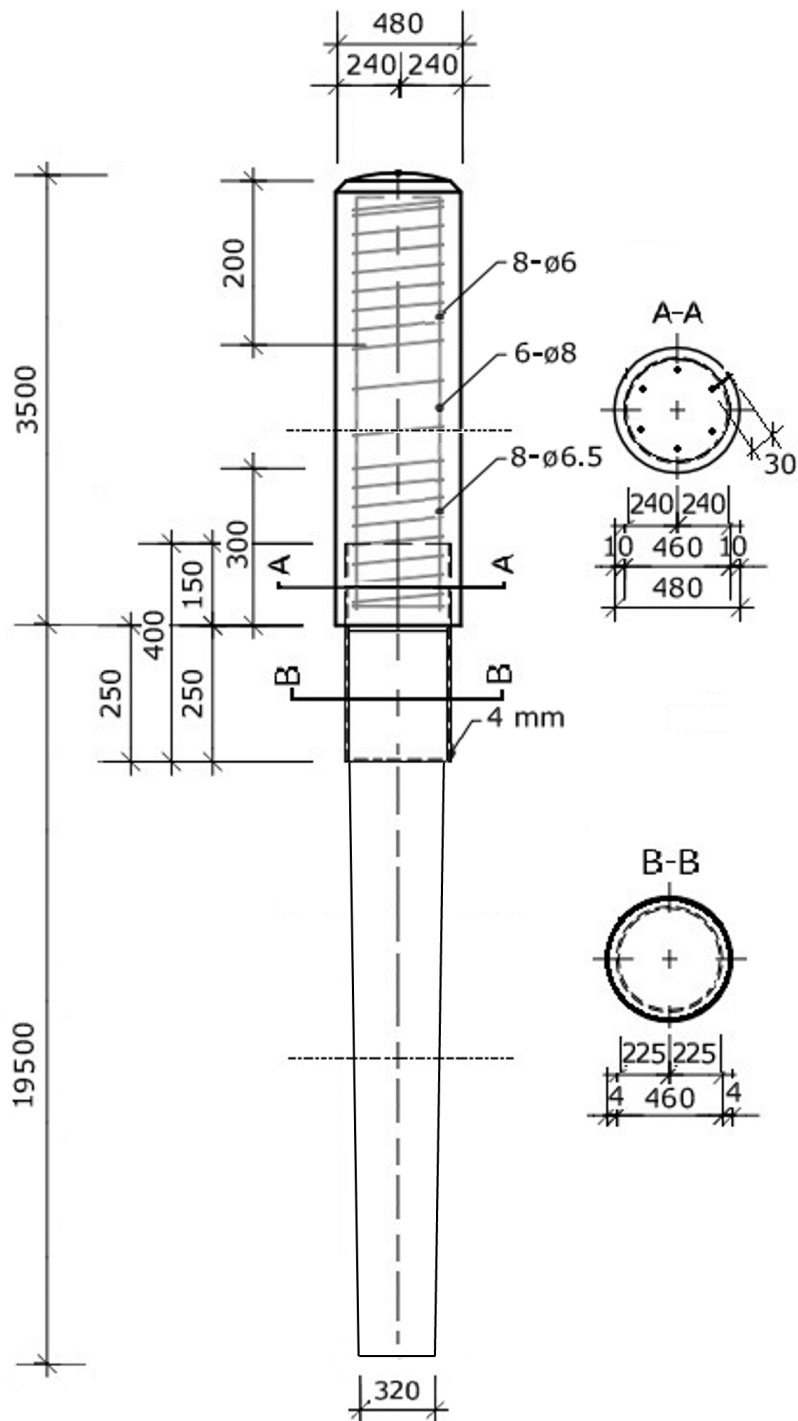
Design and dimensions of spruce tapered timber pile with concrete cap in Delft
